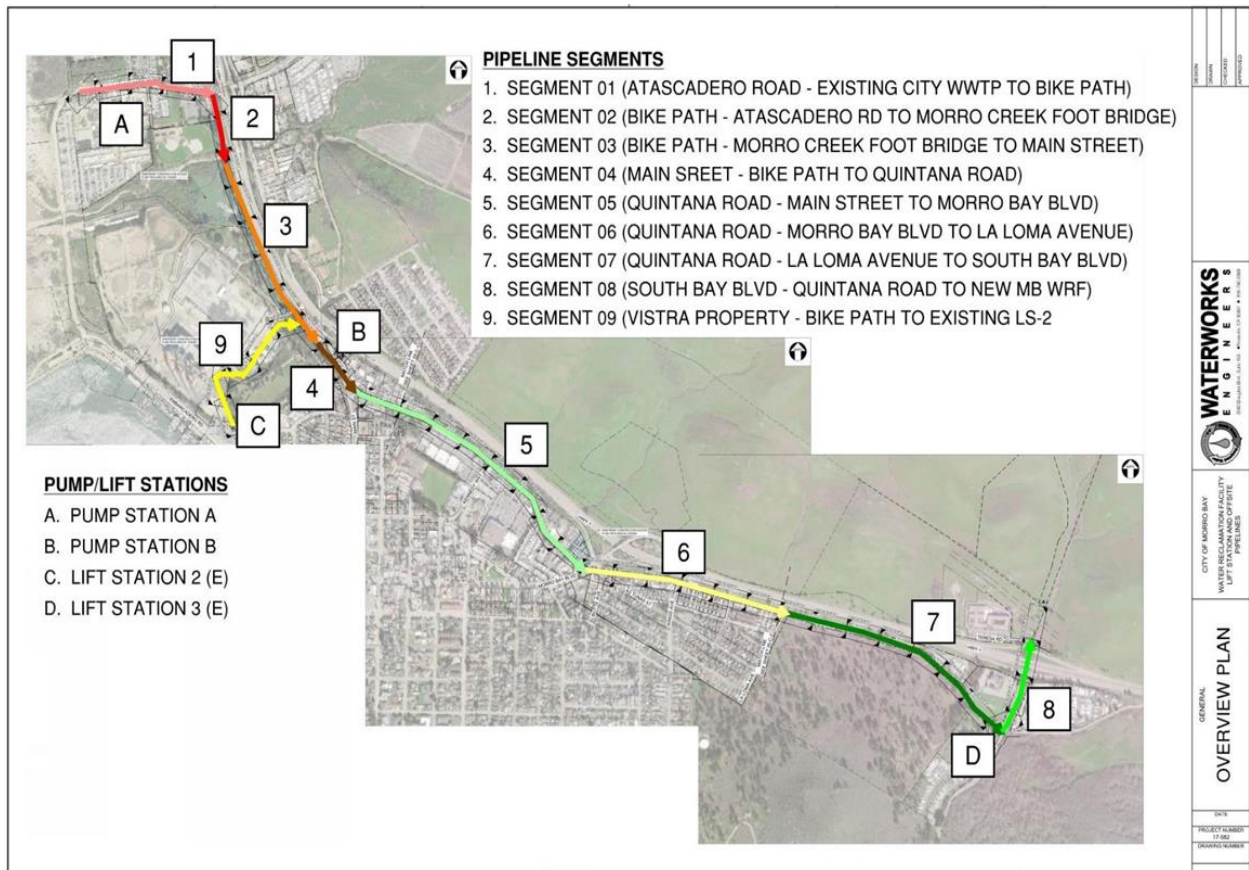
Morro Bay Conveyance Facilities Overview Plan
